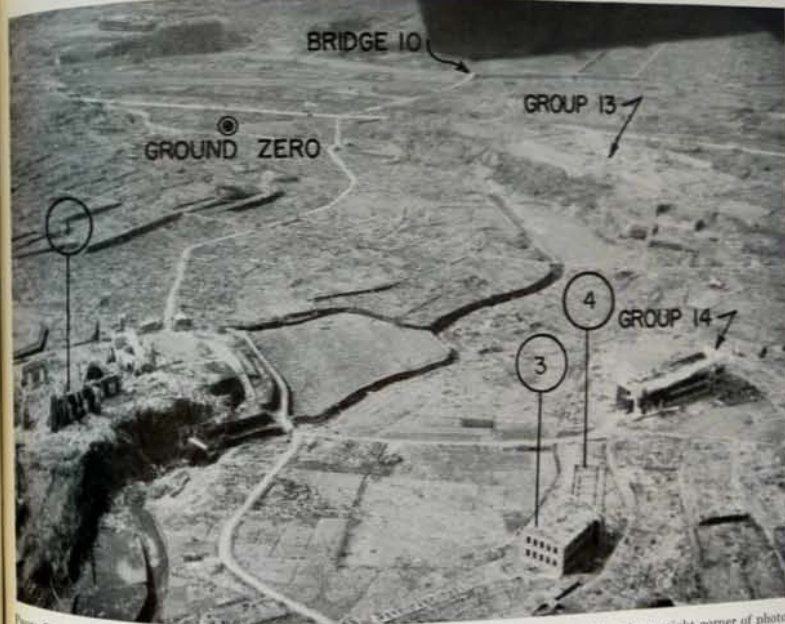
Group 15, aerial view looking west. Building 1 at left and Buildings 3 and 4 at lower right corner of photo. Also shown are Nagasaki Prison (Group 13), at upper right corner and Deaf and Blind School (Group 14) at right center. Ground zero is also shown.
